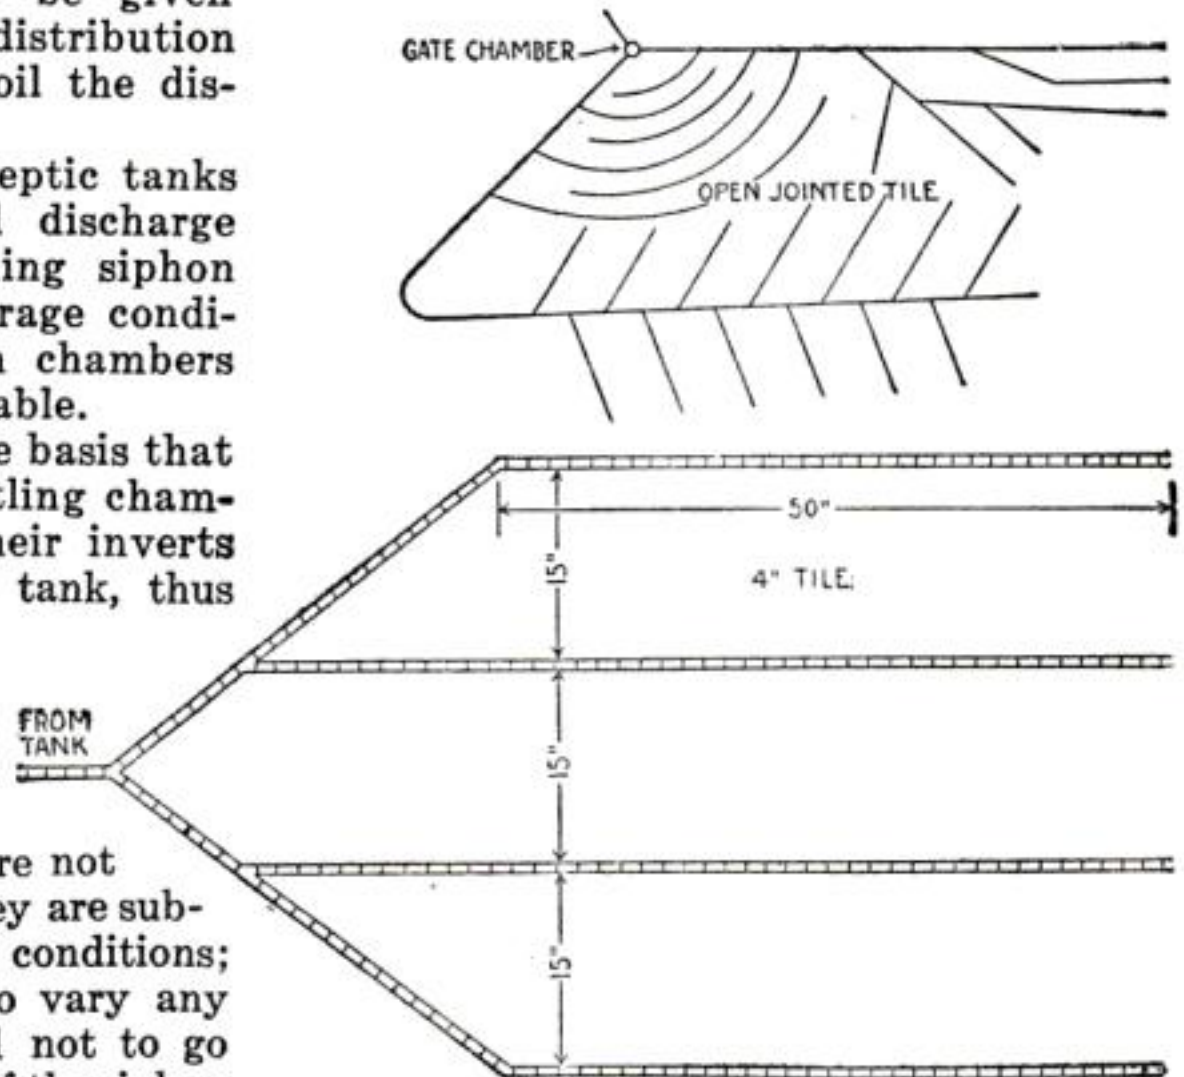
A ground plan for the laying of the tile in a system leading from a sewage disposal plant to drain the tanks underground
